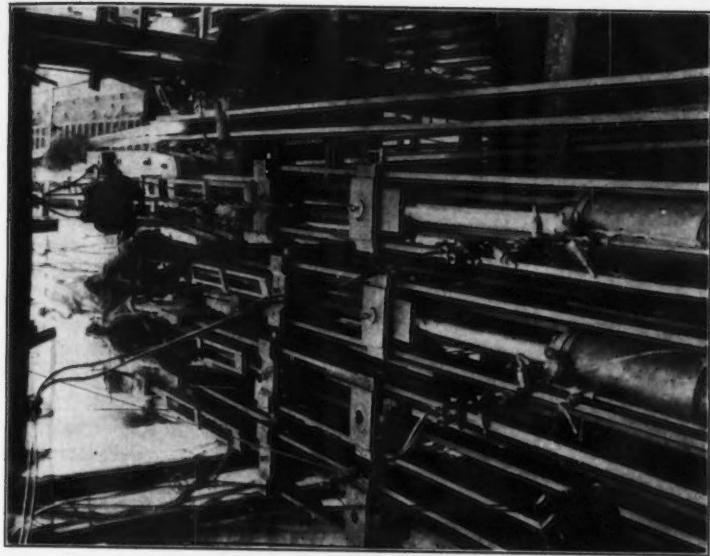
HYDRAULIC JACKS AT ANCHORAGE.
